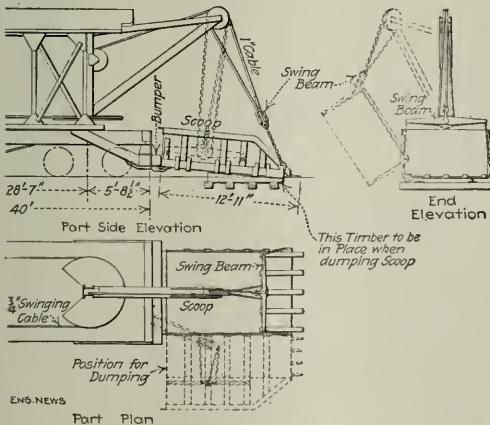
FRONT END OF SCOOP CAR, SHOWING ATTACHMENTS WHEN EXCAVATING AND DUMPING
